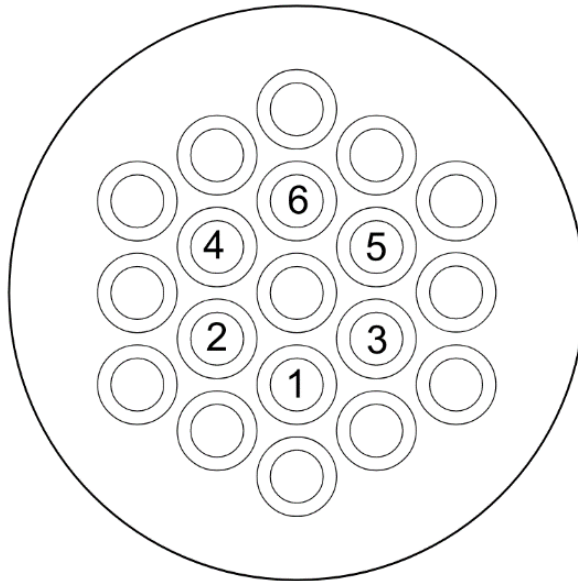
Layout of prestressing strands in post-tensioning anchor heads for specimen S06.
